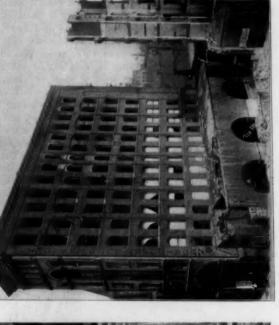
Side and rear of Horne Department Store, showing where givested roof girder pulled out column in rear wall caused by fall of water tank
